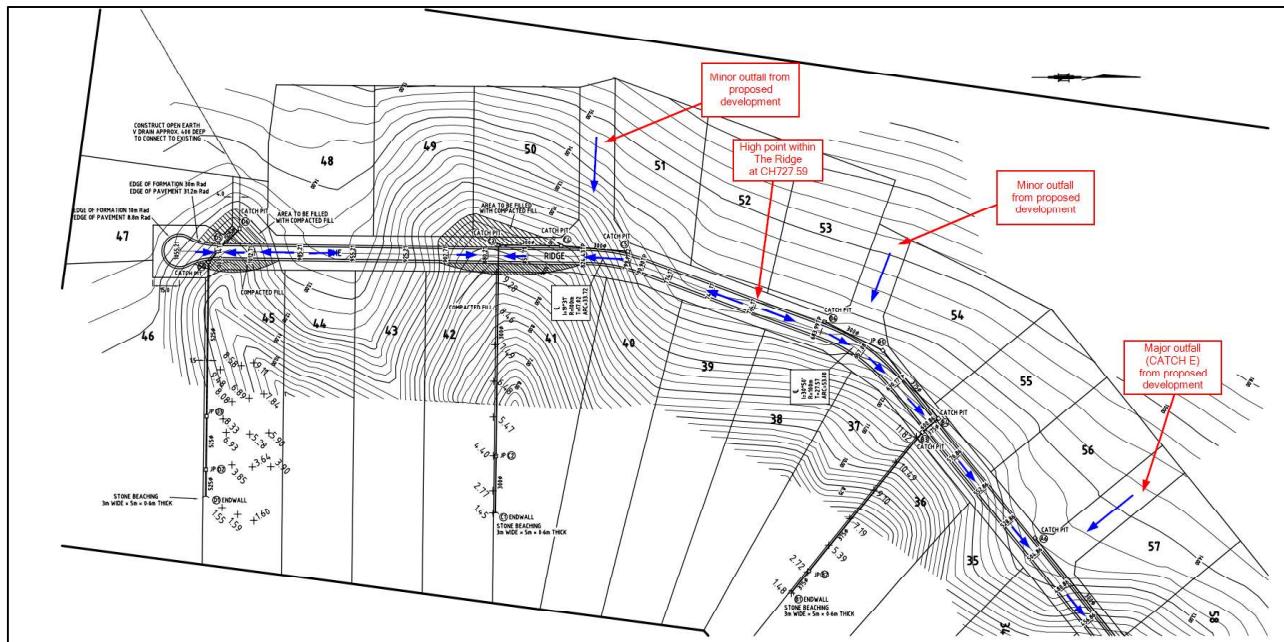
The Ridge Estate located east of proposed development (2 of 2) (Not to Scale)
